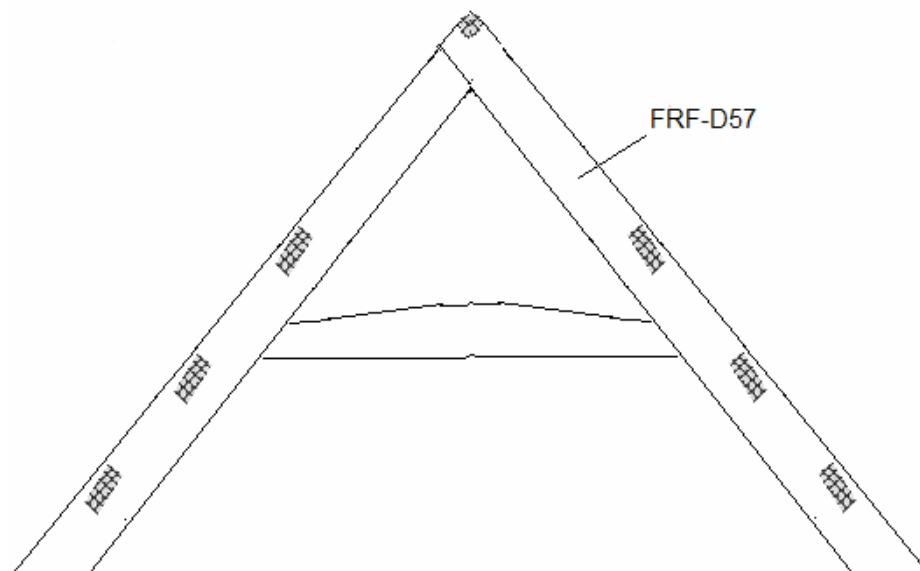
Connecting range; sketch of truss 11, showing the location of sample FRF-D47
